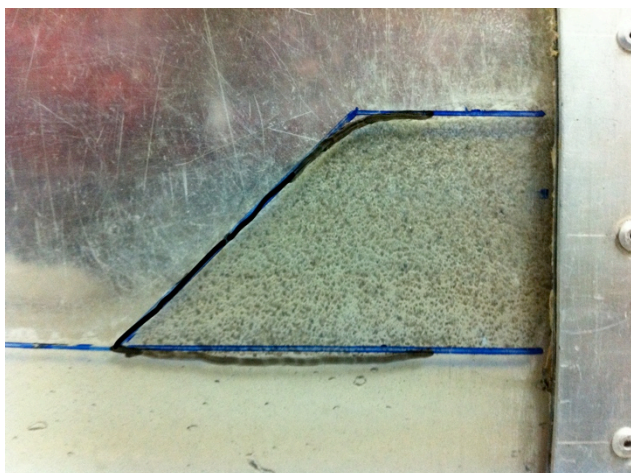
Deformation behavior of model V (reinforced embankment on soft foundation)
